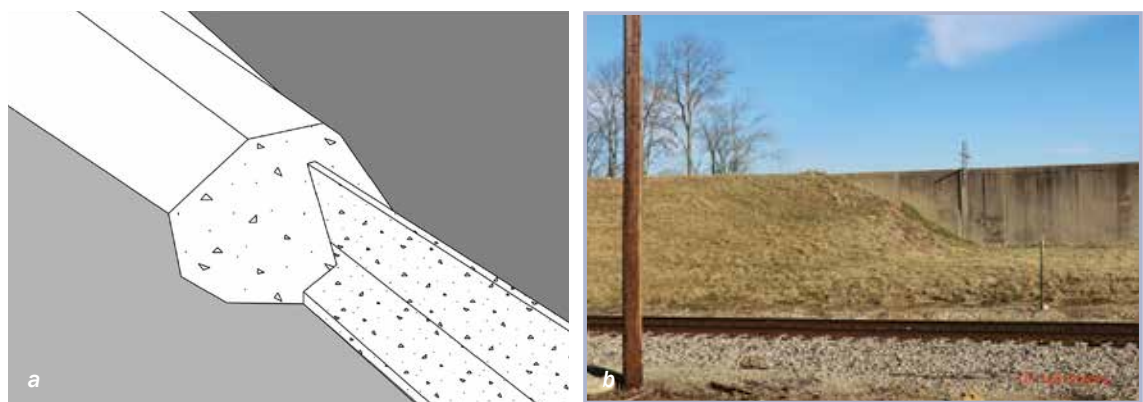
Schematic (a) and associated photo (b) of transition in terms of the geometry of the levee: change in cross-section between a levee and a flood wall, Cape Girardeau, Missouri, USA
